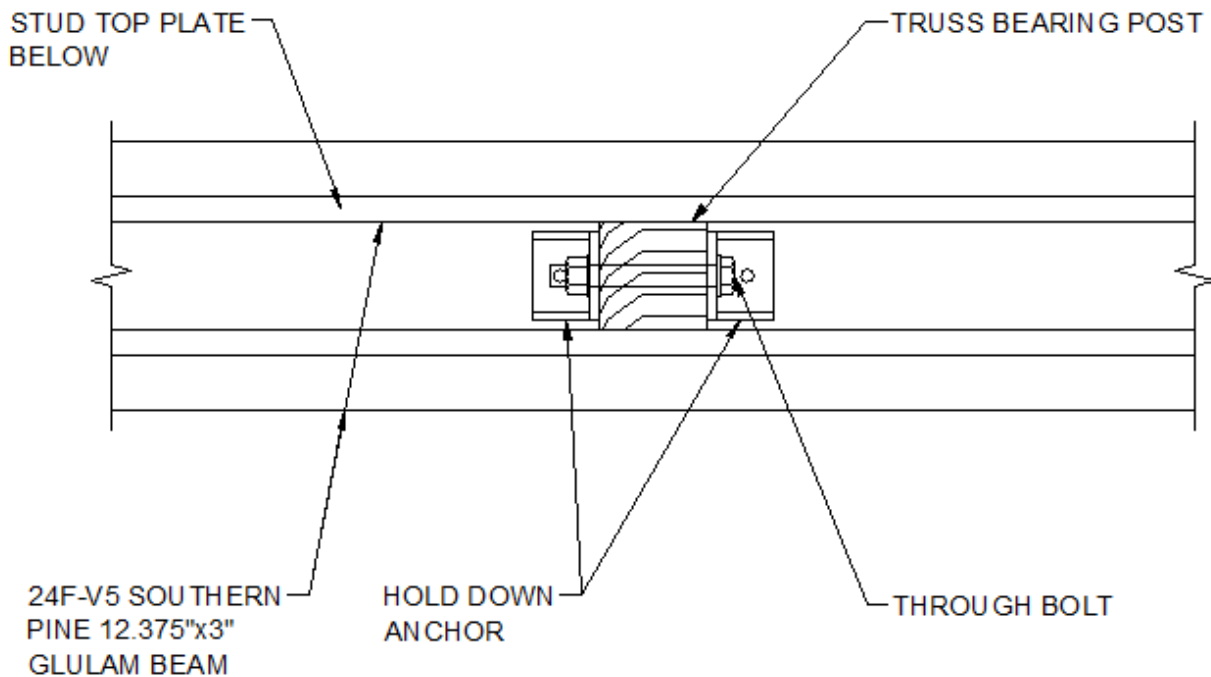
Roof Beam Tie Down Anchorage, Plan View
